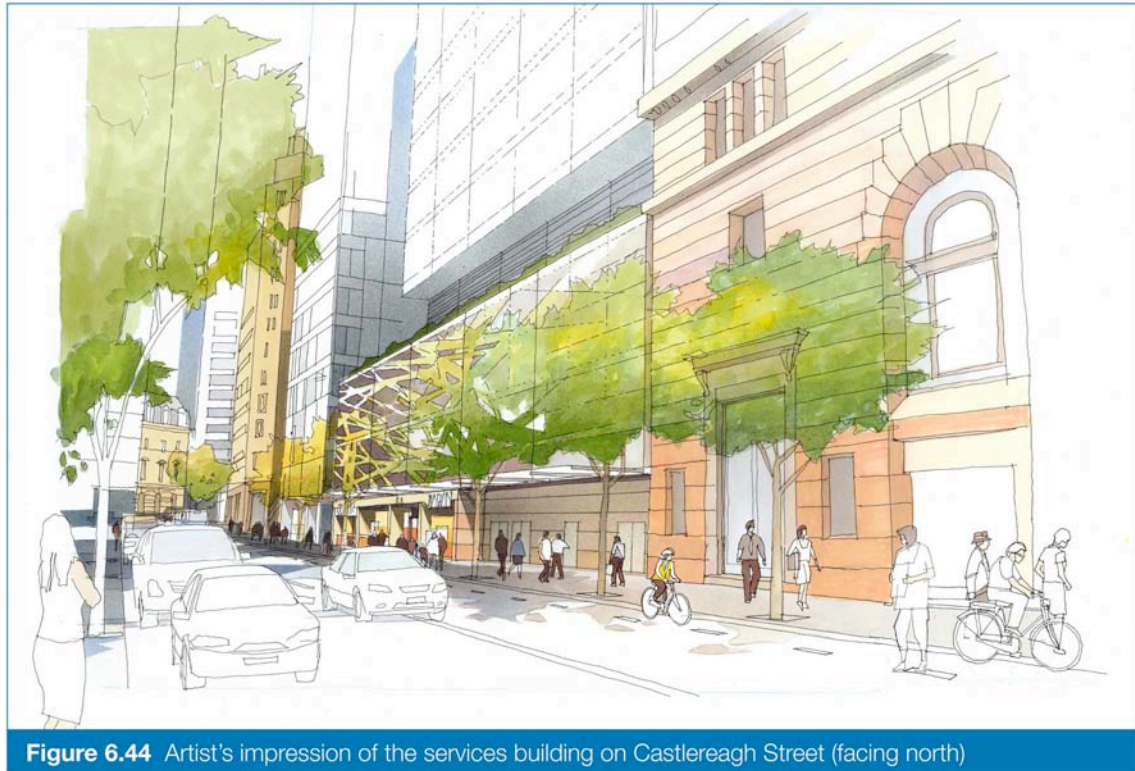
Artist's impression of the services building on Castlereagh Street (facing north)
